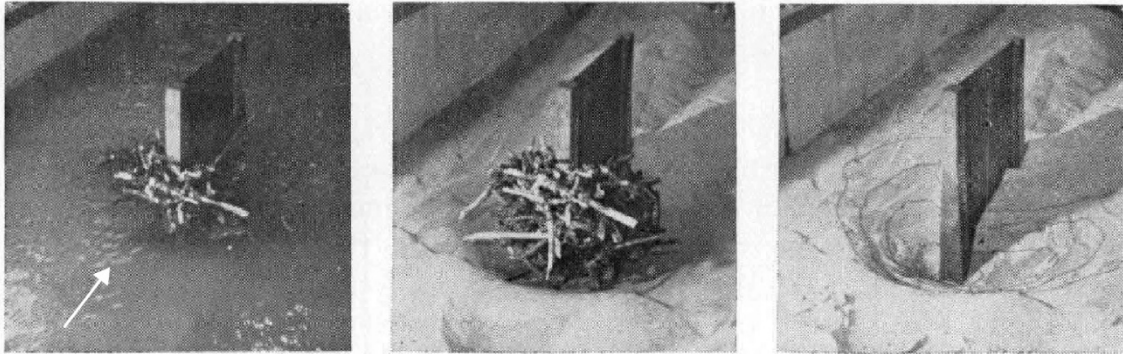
Bridge pier scour pattern due to large wood accumulation (adapted from Laursen and Toch 1956)
